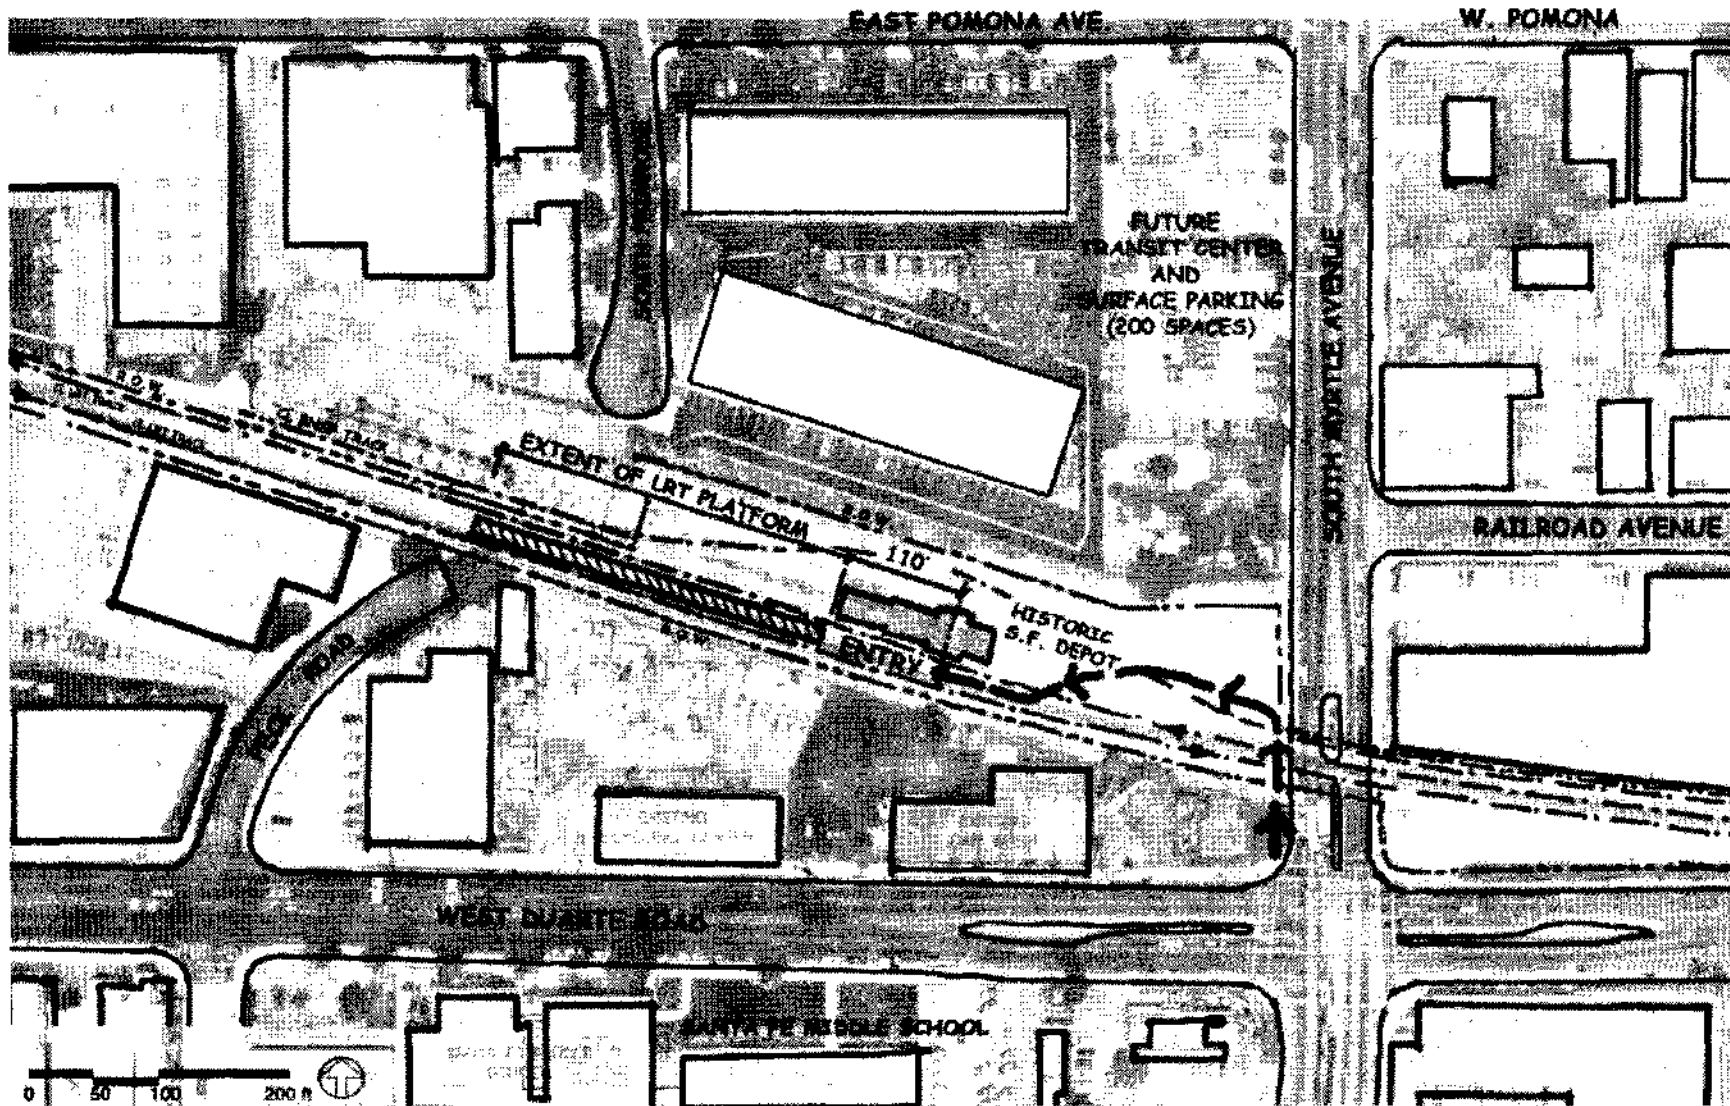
Site Plan: City of Monrovia Station, 2-Track Alternative
